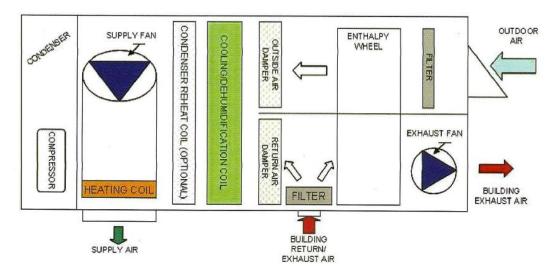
Scheme of rooftop single-zone packaged air conditioner with enthalpy wheel and condenser reheat coil. /2/.
